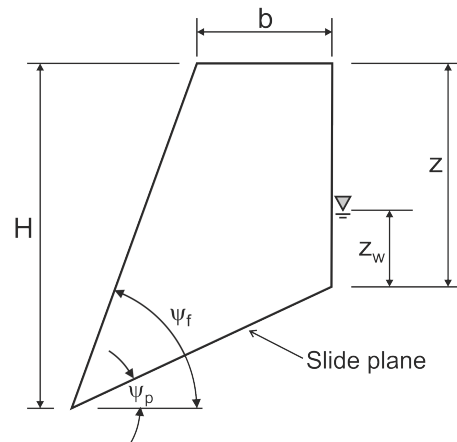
Cross-section of block used in design to model the assemblage of rock blocks in the slope.
